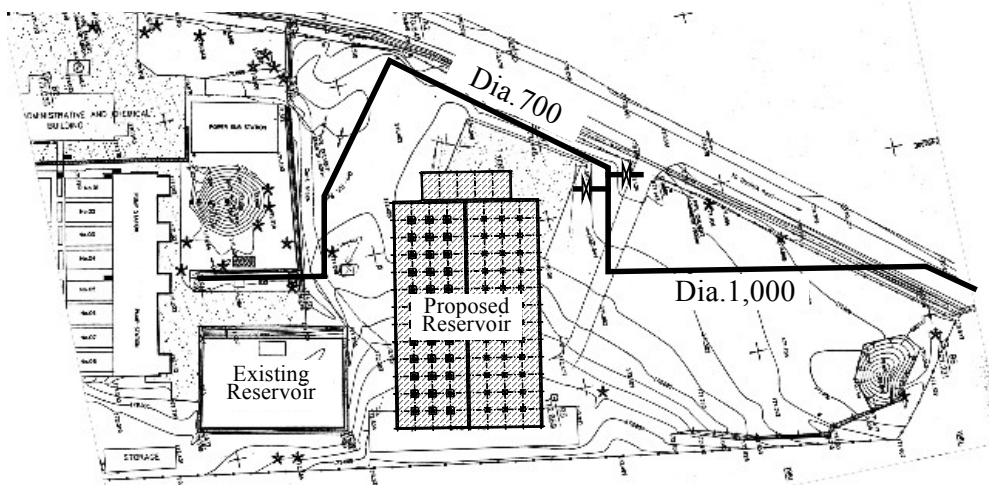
Yard Piping Arrangement for Improvement of Chinaimo Treatment Plant
